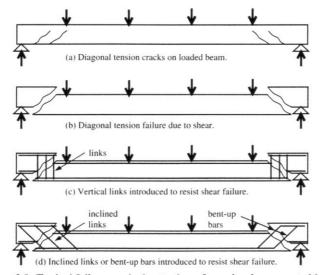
Typical failure mode due to shear for a simply supported beam
